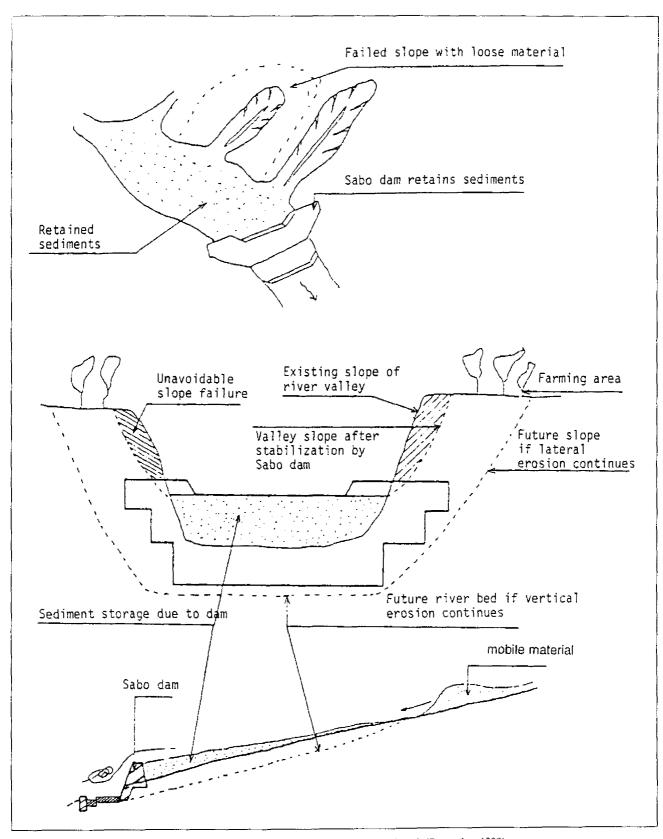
Typical configuration of a concrete check dam in sediment-control work (Supangkat, 1989).
